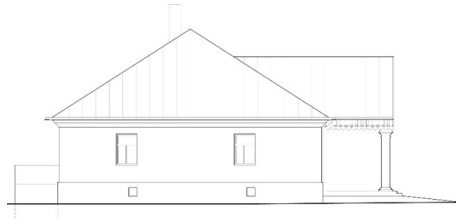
(right): *Architectural and structural survey of the manor building. Side, west-facing elevation.* By M. Krupa, D. Kuśnierz-Krupa, Ł. Bednarz, 2021.
